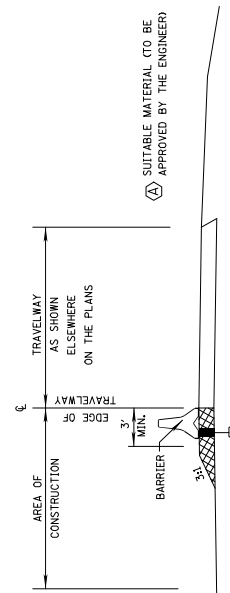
DETAIL OF POSITIVE BARRIER WITH IMPACT ATTENUATOR
